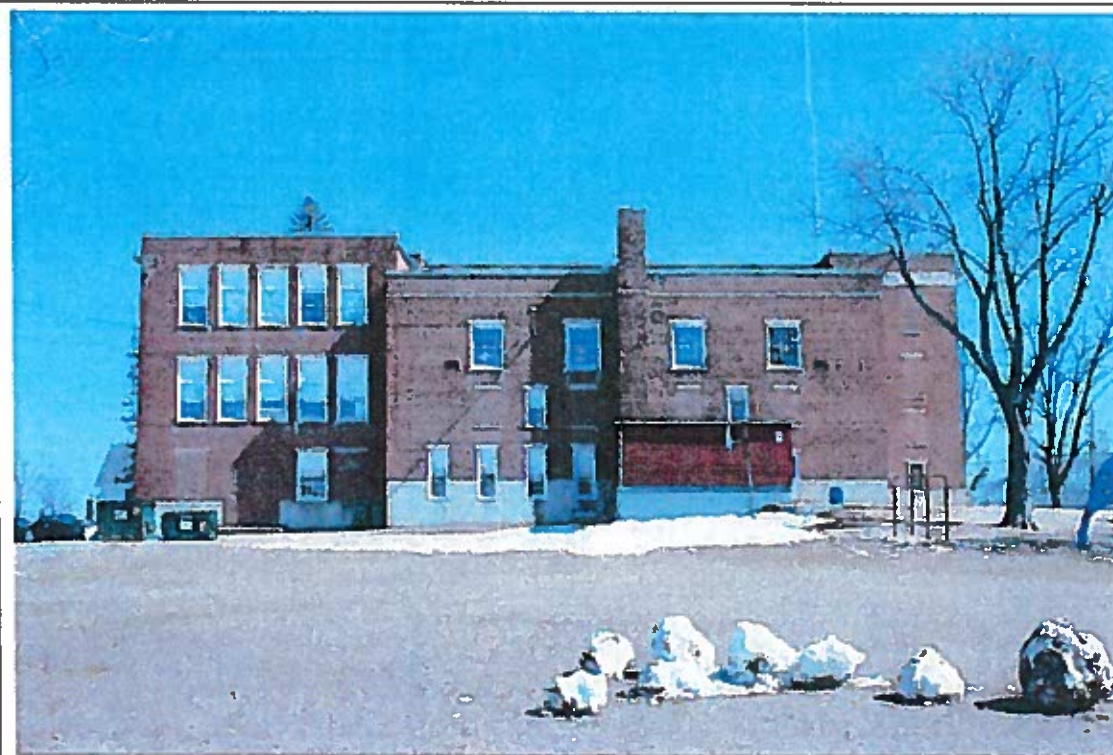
Rear (W) elevation	Looking: SE	Photo File # 2-19
